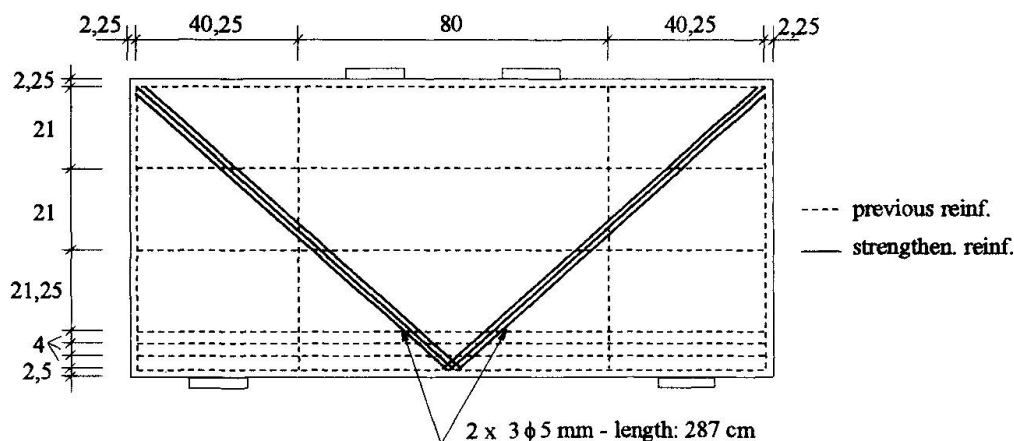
Beam 5/S strengthening reinforcement detail (cm)
